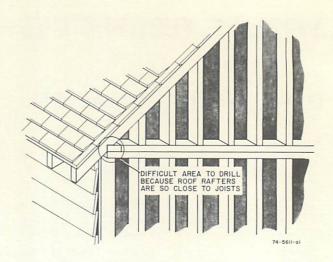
Access to Top of Outside Walls—Frame Buildings.
